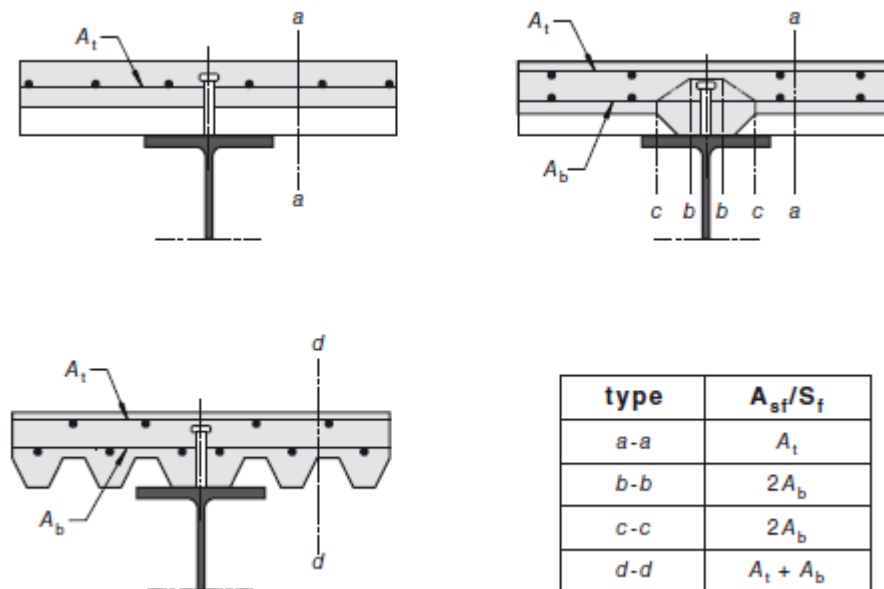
Potential; surface of shear failure with profiled steel sheeting
